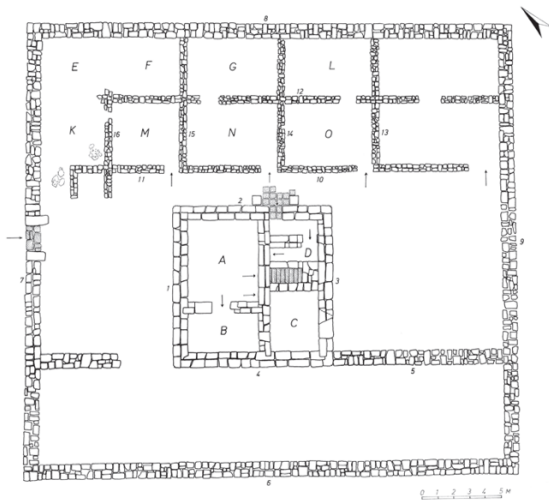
Plan of Çuka (with 5 m-scale; Çondi 2017, 166)
